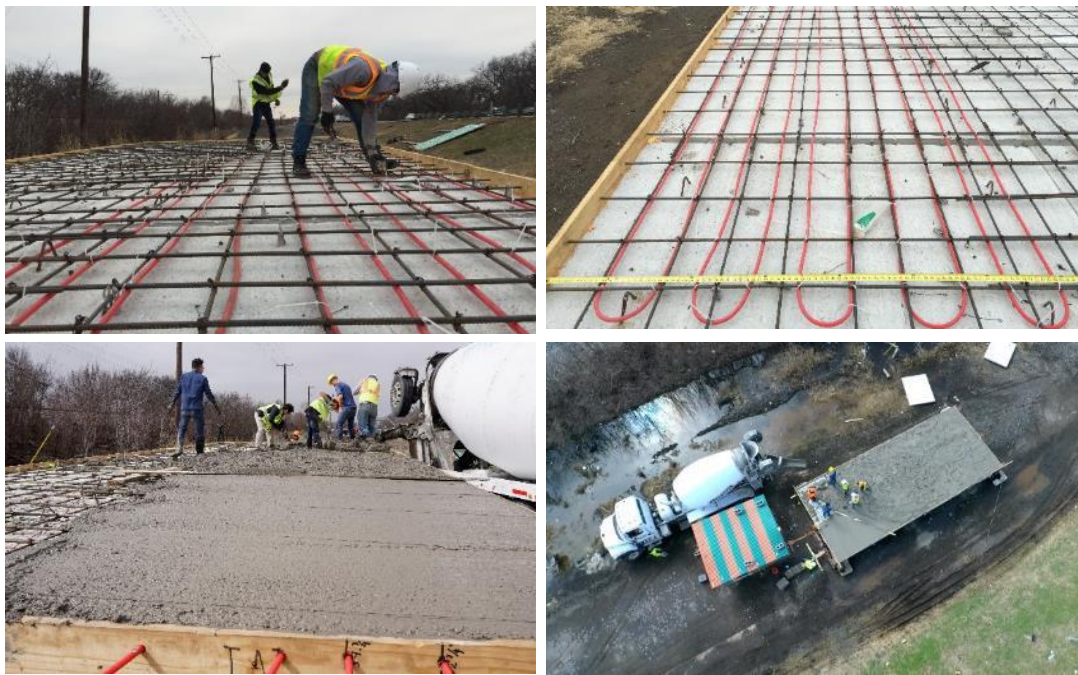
The construction process of stage 2: Internal hydronic loop and concrete casting
